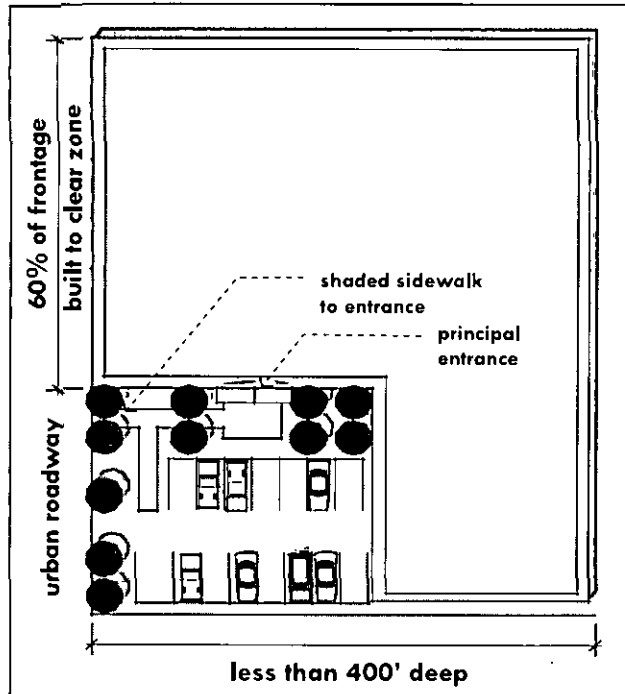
Parking is permitted between the building and the roadway on shallow lots less than 400 feet deep, when certain conditions are met.
